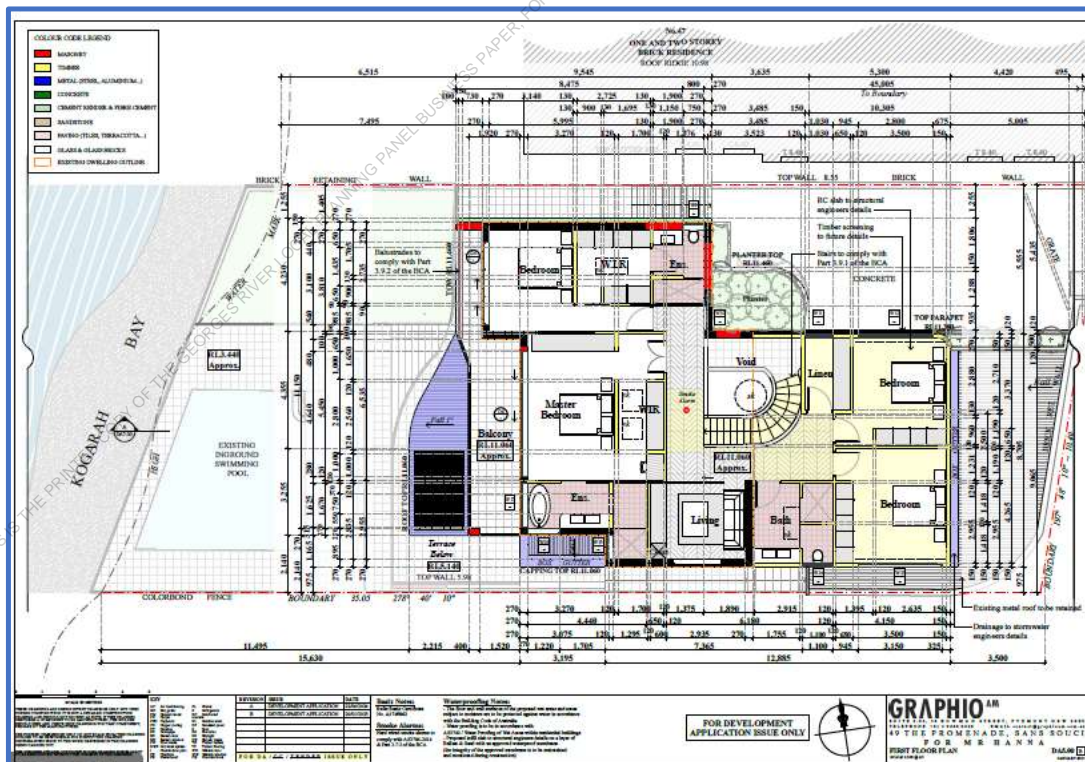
First Floor Level plan showing planter above entry way and narrow planter atop garage roof (Source: Amended Architectural plans)
